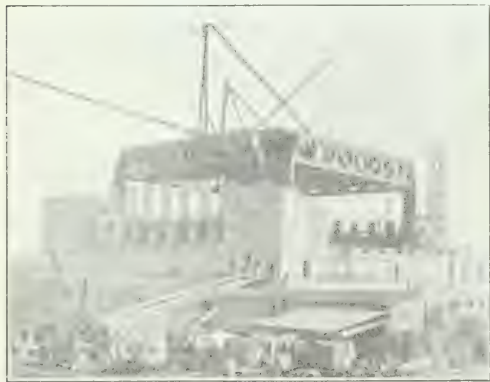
View During Construction. Showing Trusses for Supporting the Banquet Hall.
